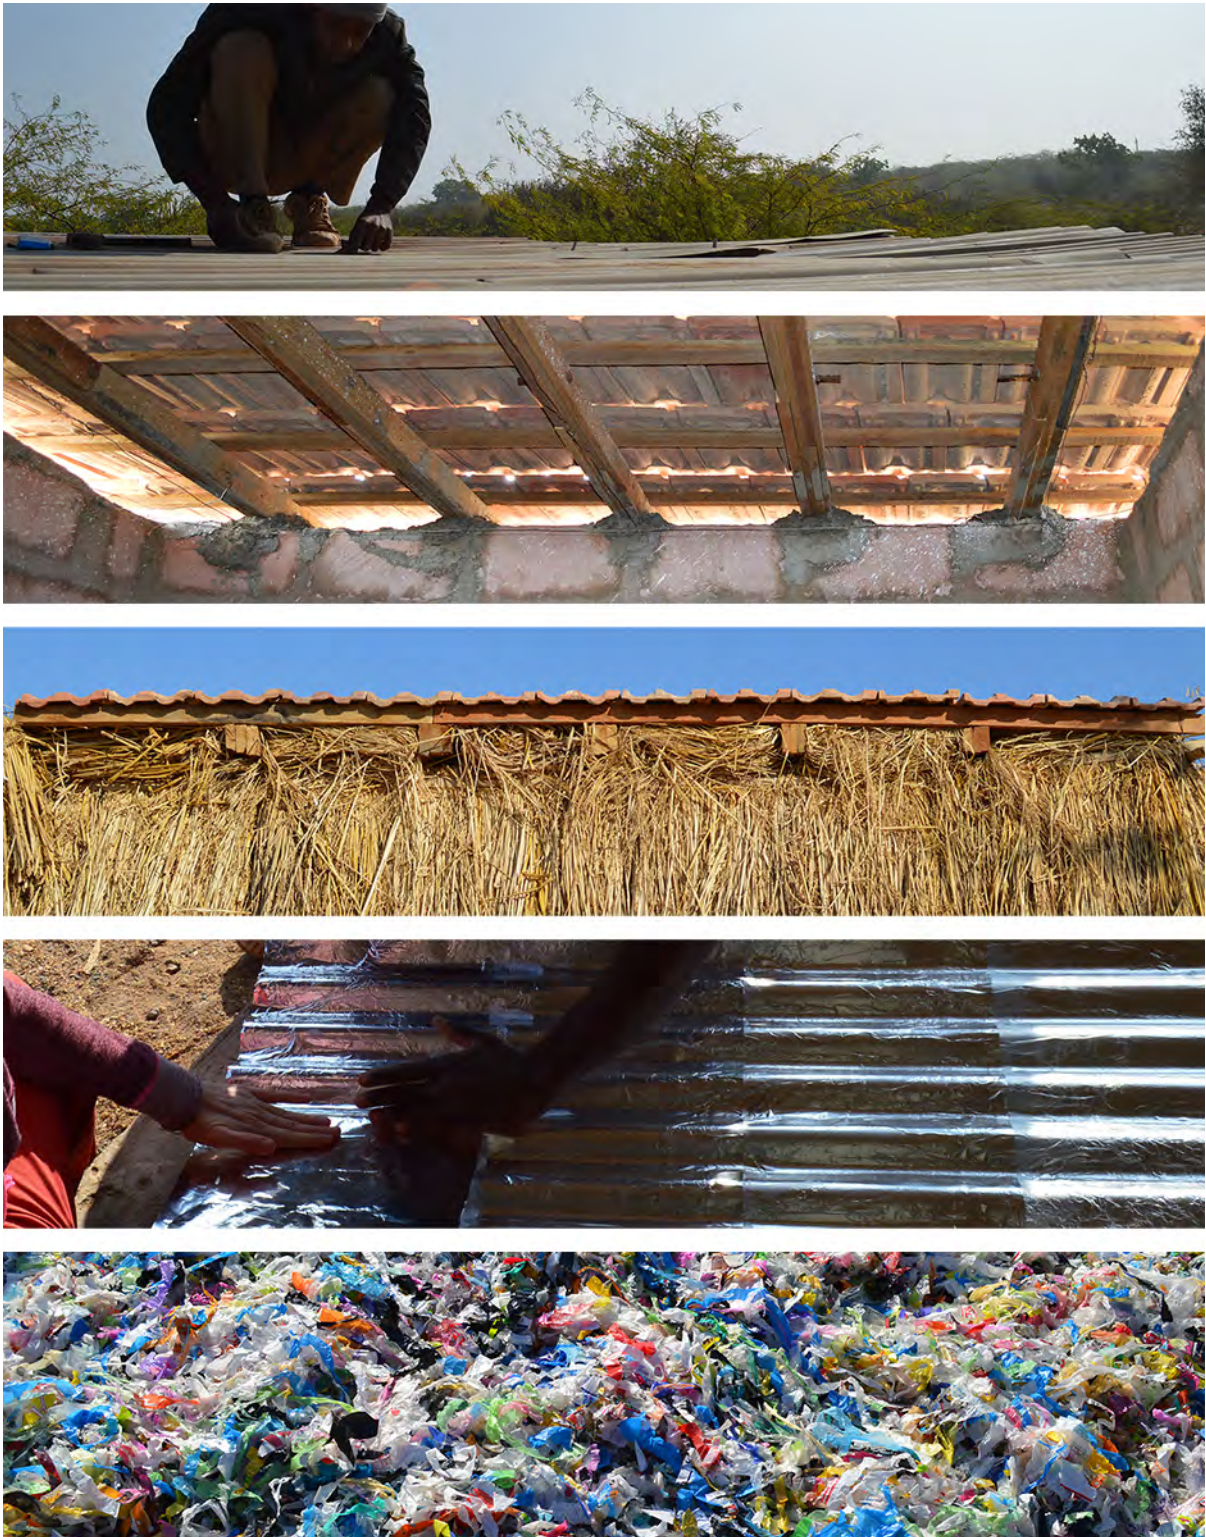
Chamber building materials. From top to bottom: corrugated tin sheet roof, Mangalore Pattern clay tile roof with sandstone block walls, exterior straw insulation, aluminum foil as radiant barrier, shredded waste plastic for insulation panels.
